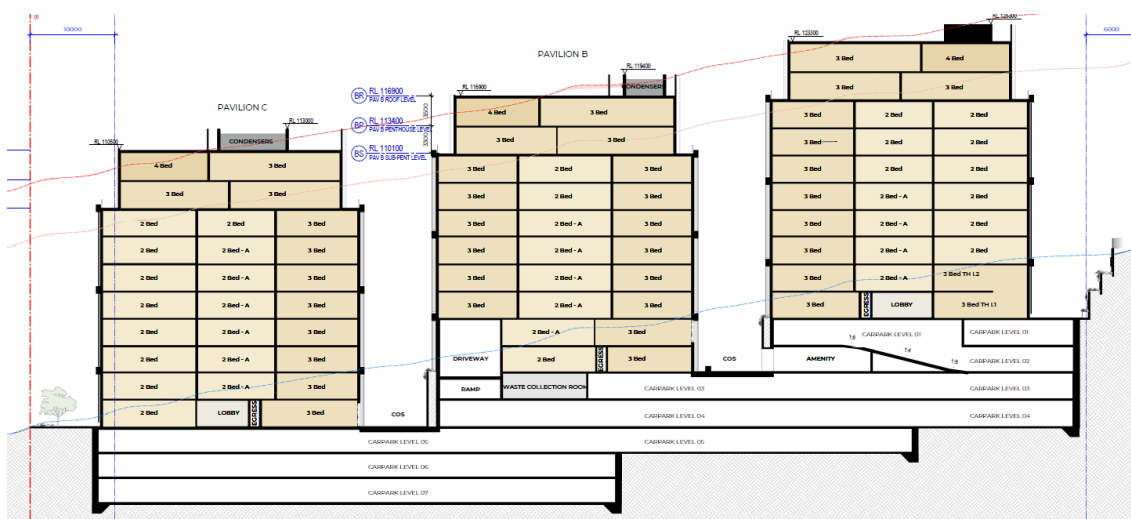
Extract of site section (source: Woods Bagot, Proj. 122021, Dwg. DA-AR-B-32-101, Rev. B, 9 April 2025)
